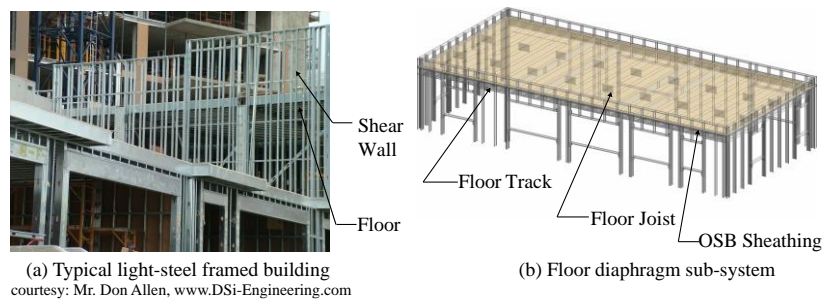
(a) Light steel framing and (b) wood sheathed floor sub-system
